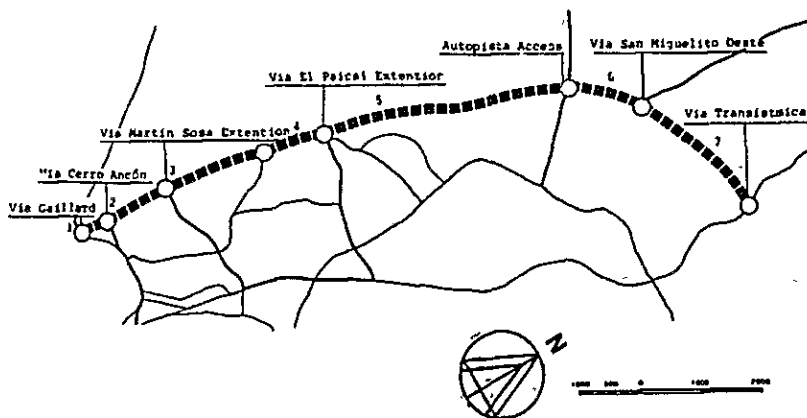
SECTIONS OF CORREDOR NORTE BY MAIN INTERSECTIONS
